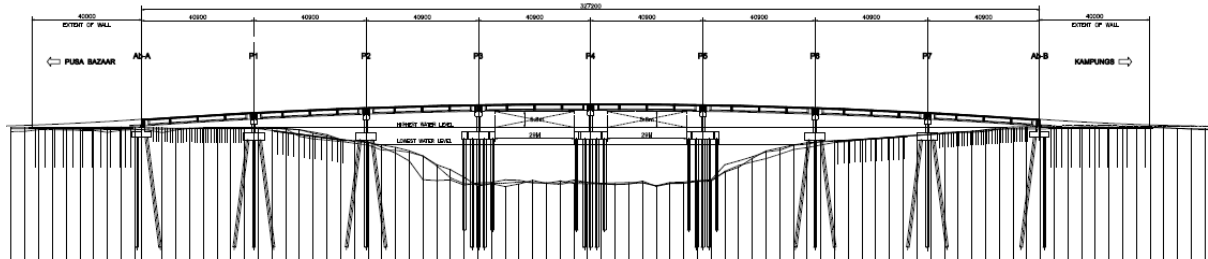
Longitudinal section of Sg. Rimbis Bridge
